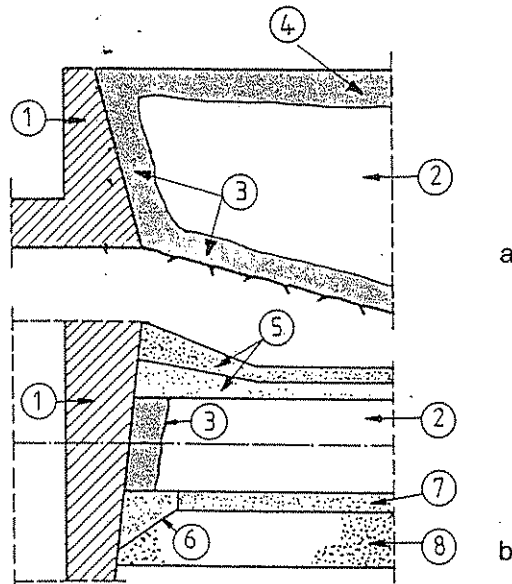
Rockfill dam with earth core. Interface of the core and a concrete structure.
